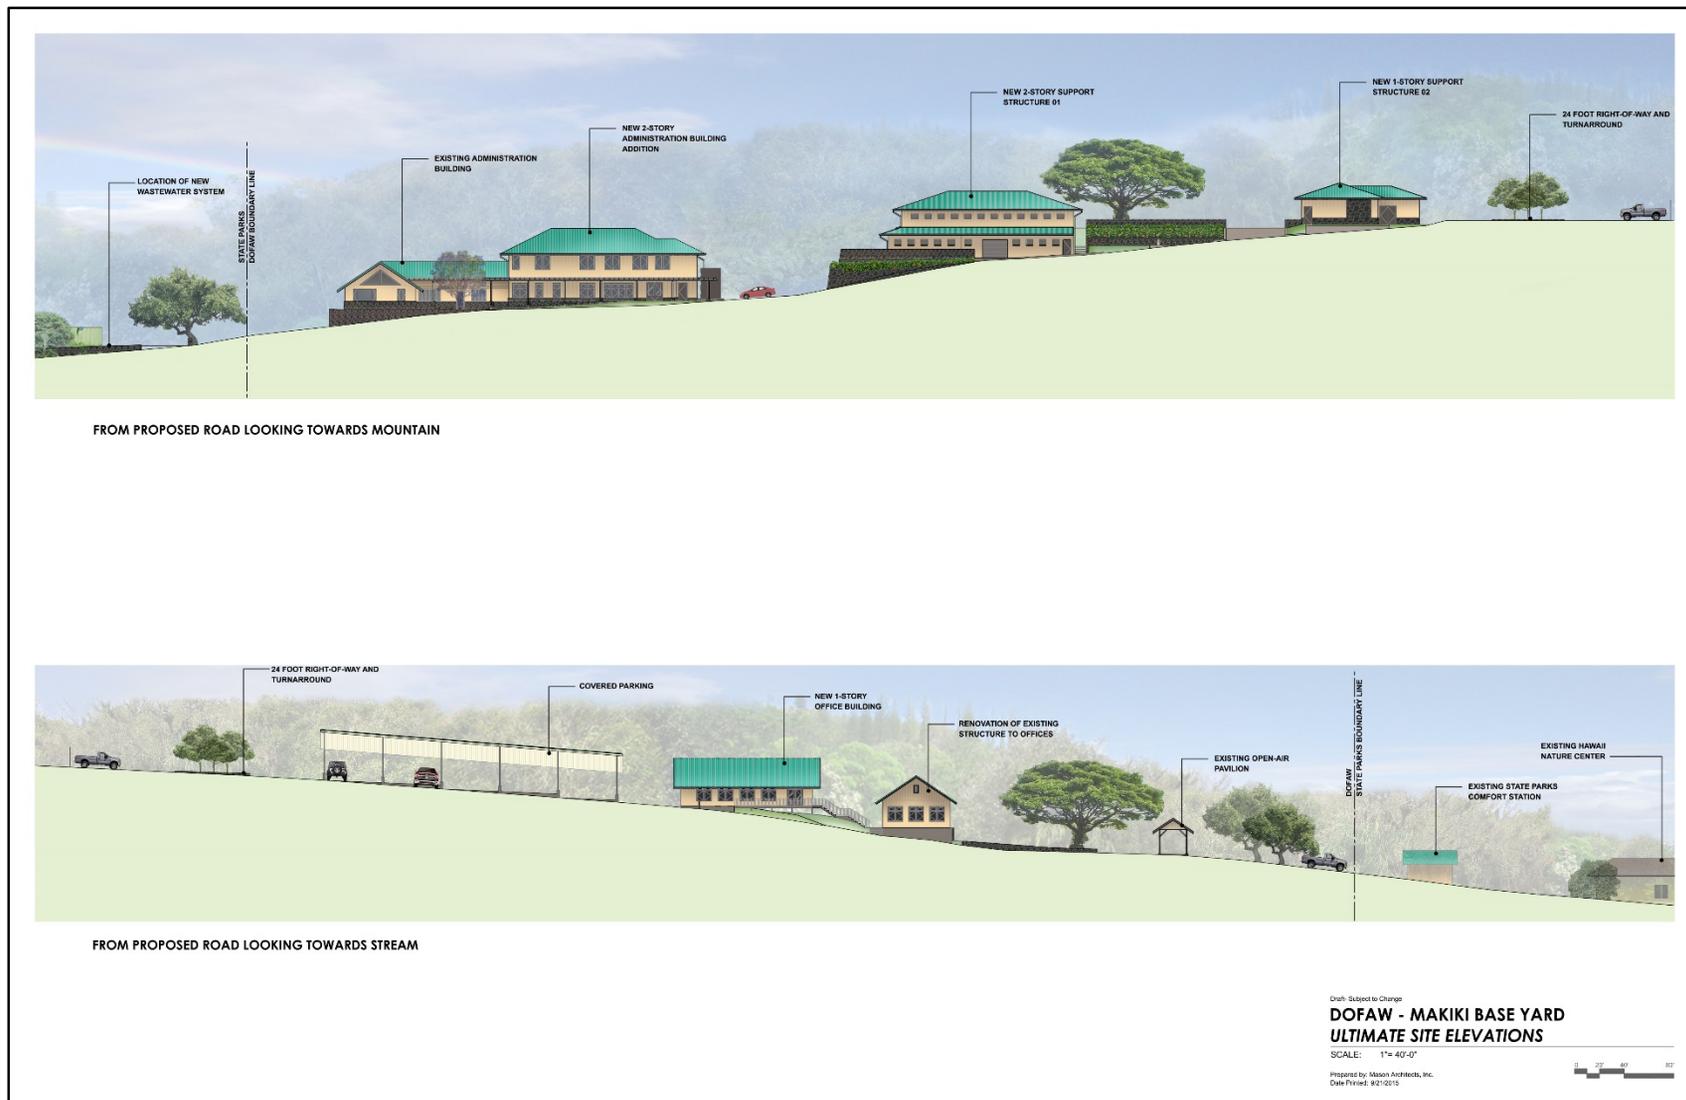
DOFAW Makiki Base Yard Site Elevations (Mason Architects, Inc. 9/21/2015)
